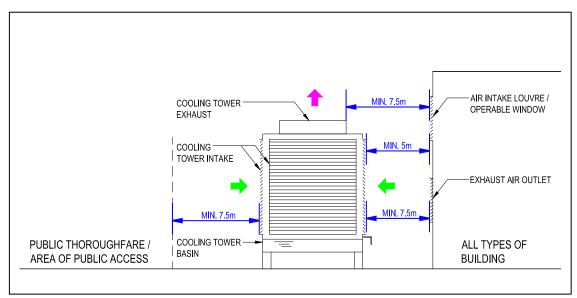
Minimum separation distance requirements for cooling tower installed on podium roof
